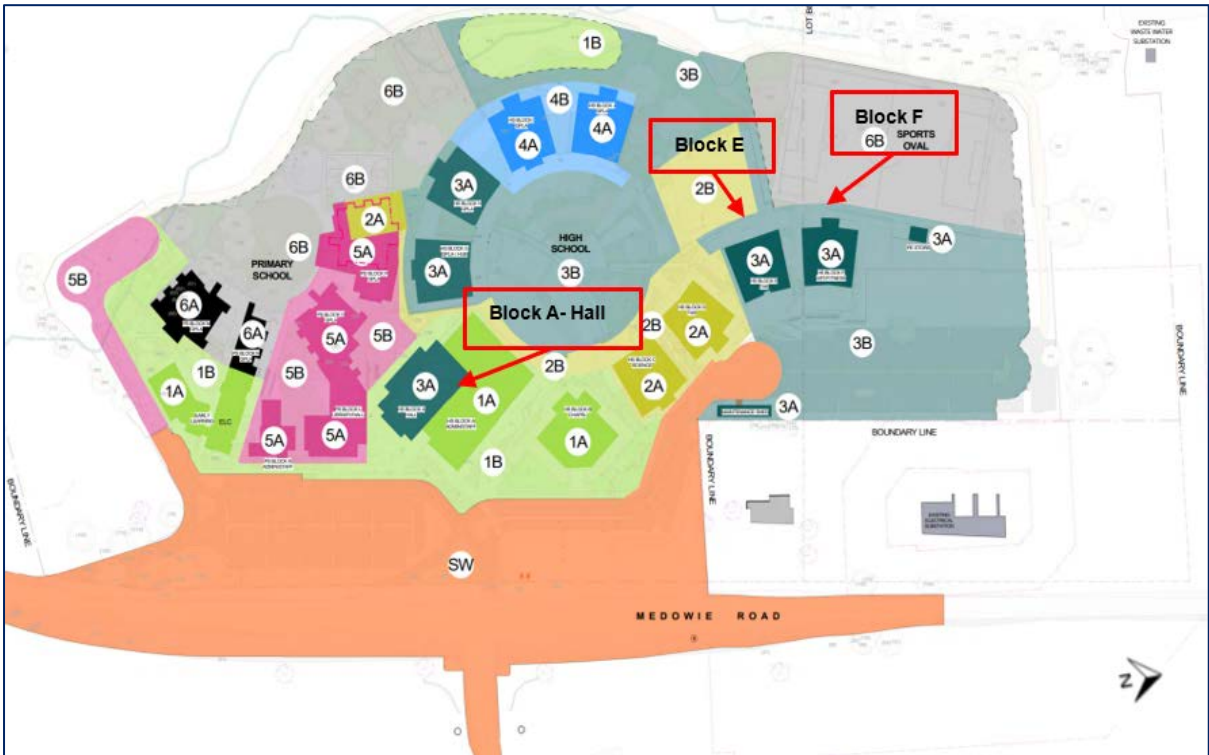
| Staging Plan – as proposed to be modified (Source: Applicant's Modification Report)
